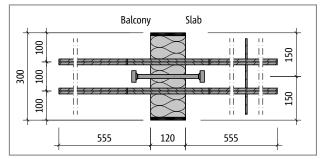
Schöck Isokorb® XT type Q-P-VV1: Product plan view
